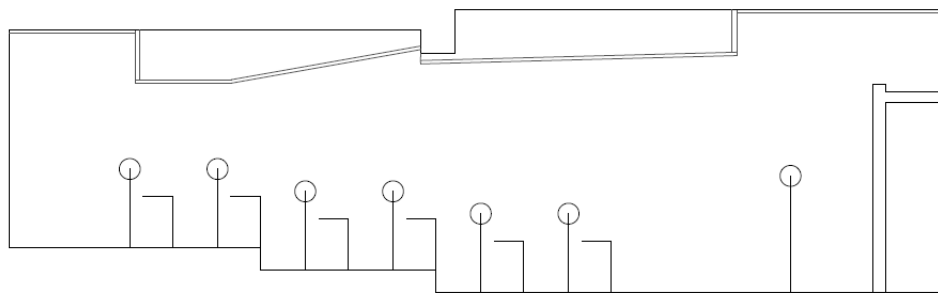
Section of Lecture Hall – Proposed Ceiling Reflectors
